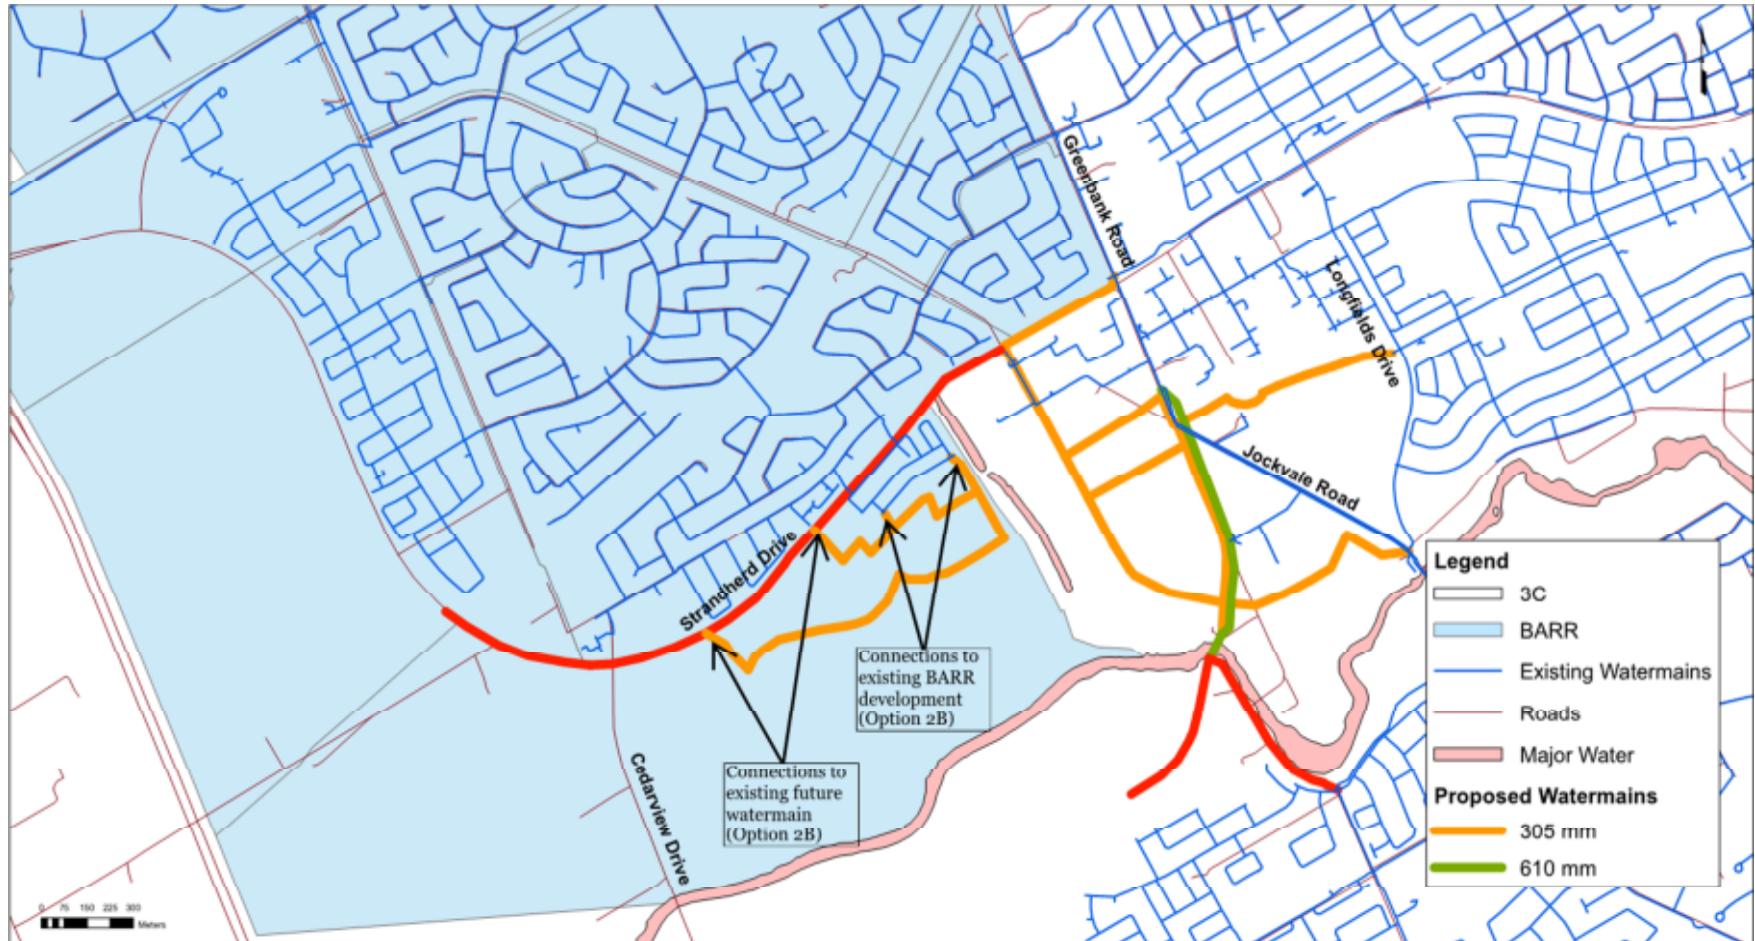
Proposed Pipe Layout Post Zone Reconfiguration – Scenario 2B
